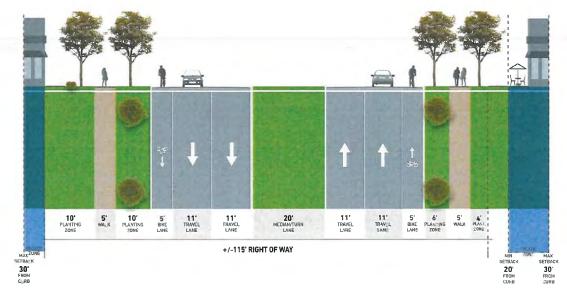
Typical Section (Woodlawn Avenue to Gladys Road) on West Broad Street in the Central Transition Sub-District
